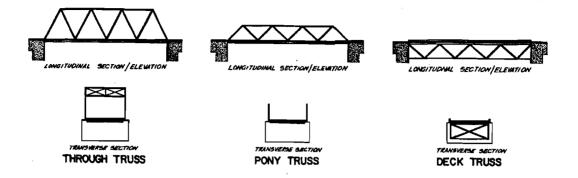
Through, Pony, and Deck Trusses. Courtesy of Historic American Engineering Record.
